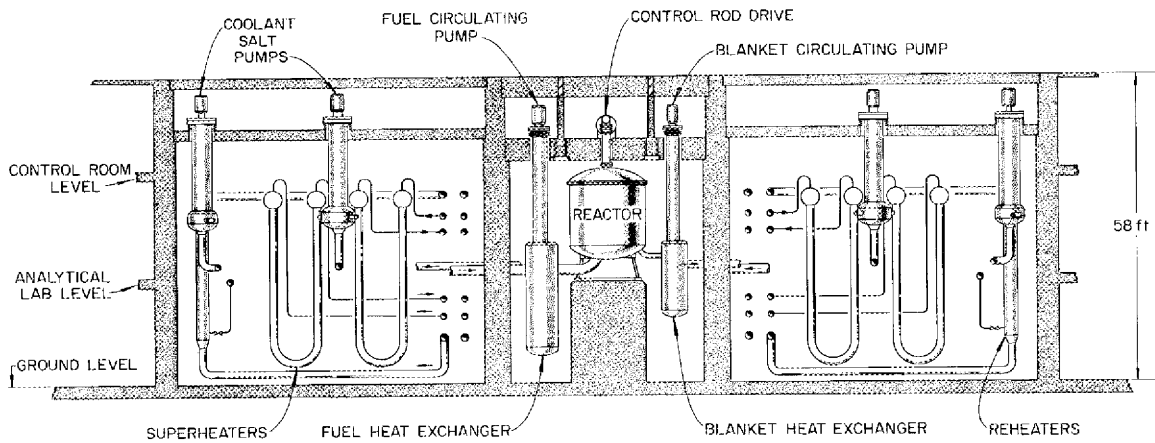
Elevation View of MSBR Reactor Arrangement.
